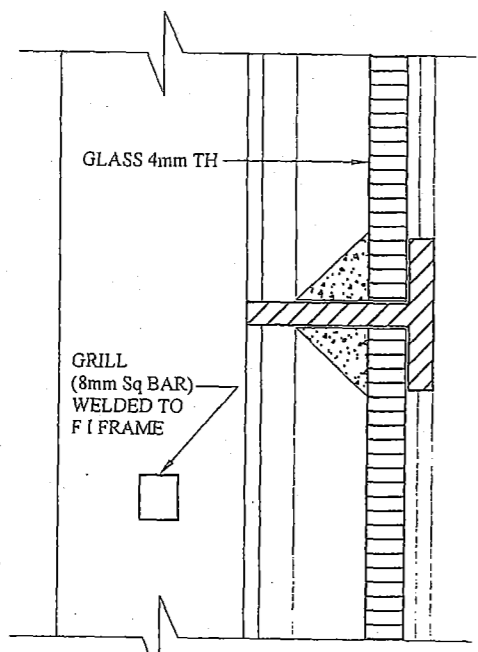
DETAIL OF 'Z' SECTION AS HANDLE AND STOPPER
